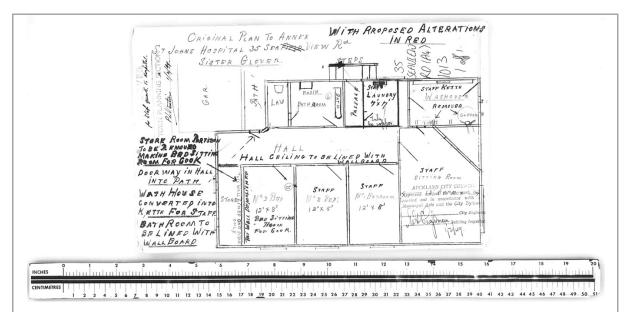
Proposed internal to the staff quarters in 1949 (AKC 339 Building Permit and Consents Aperture Cards 1908-1997, Auckland Council Archives).
